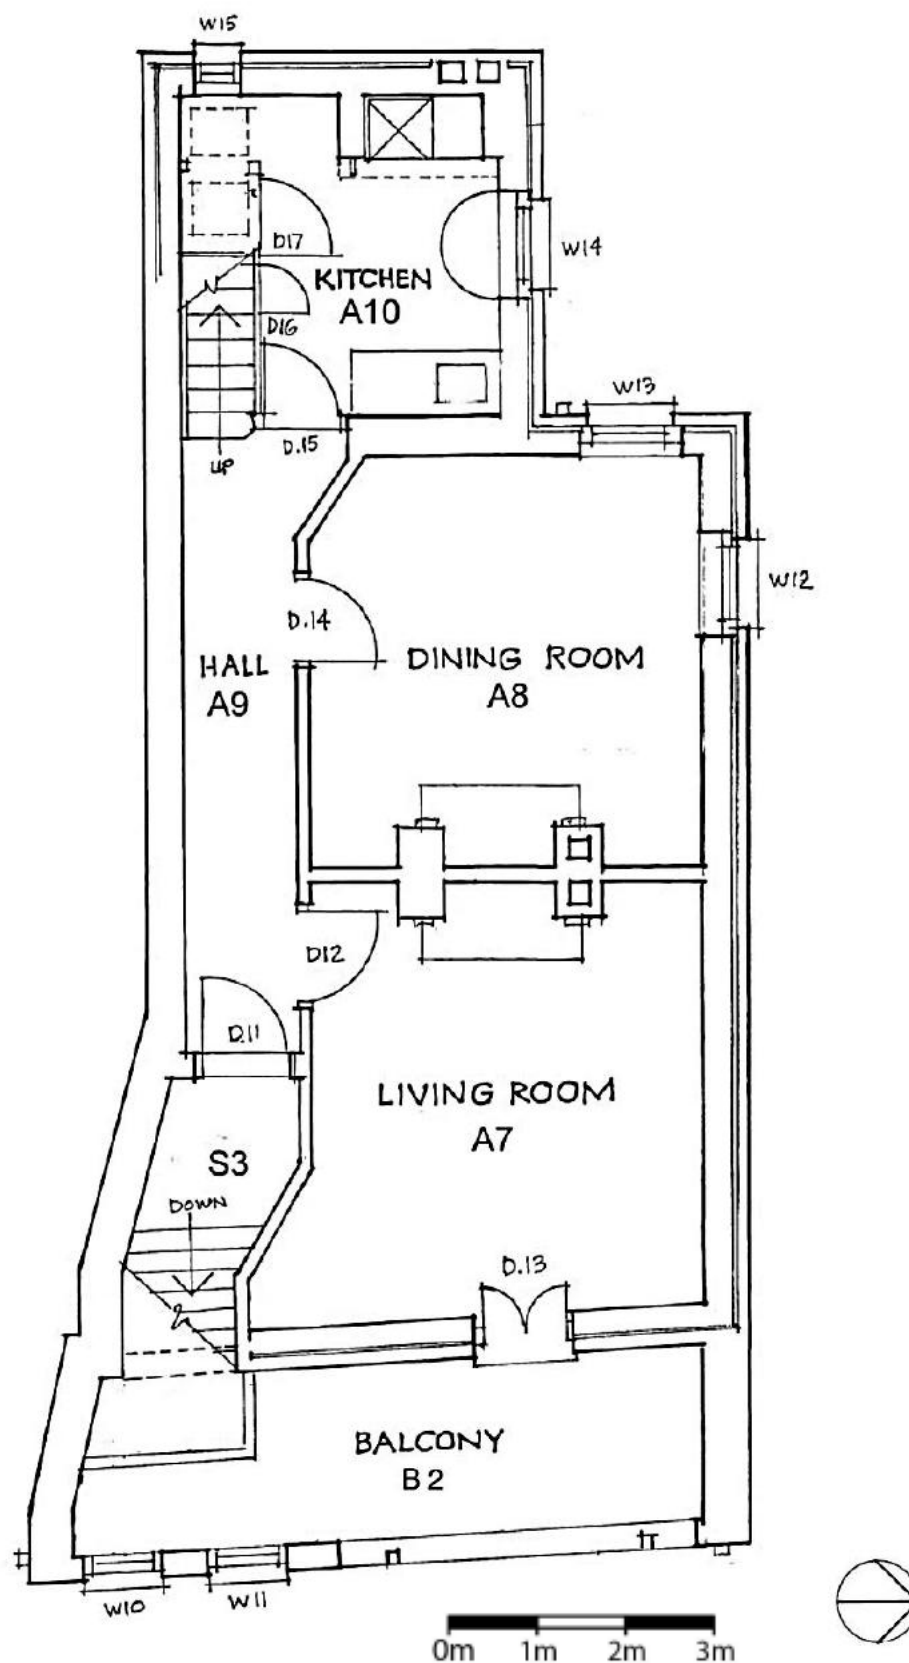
117-117A Gloucester Street – First floor plan Source CLSP
